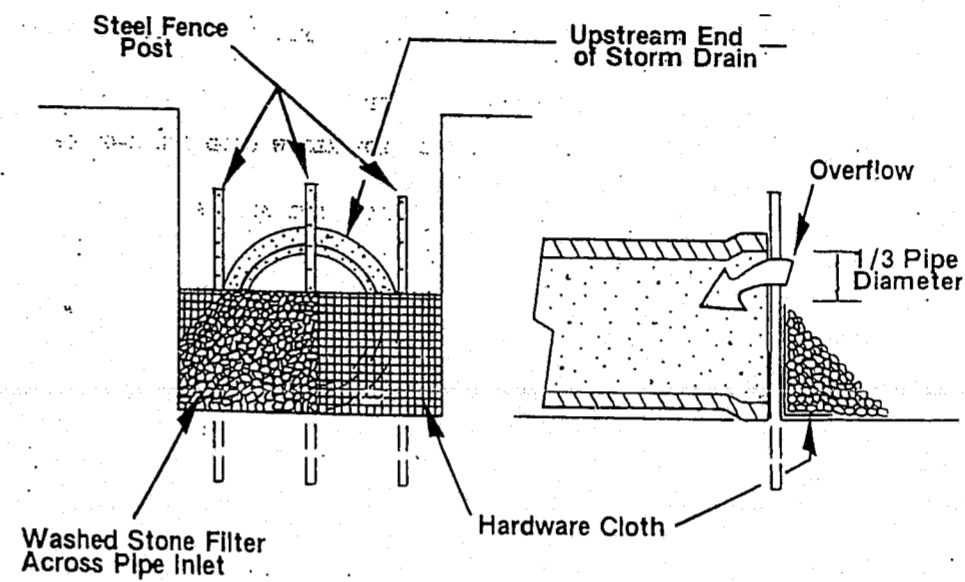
Illustration of Stone Filter Inlet Protection for Storm Drain Under Construction.
